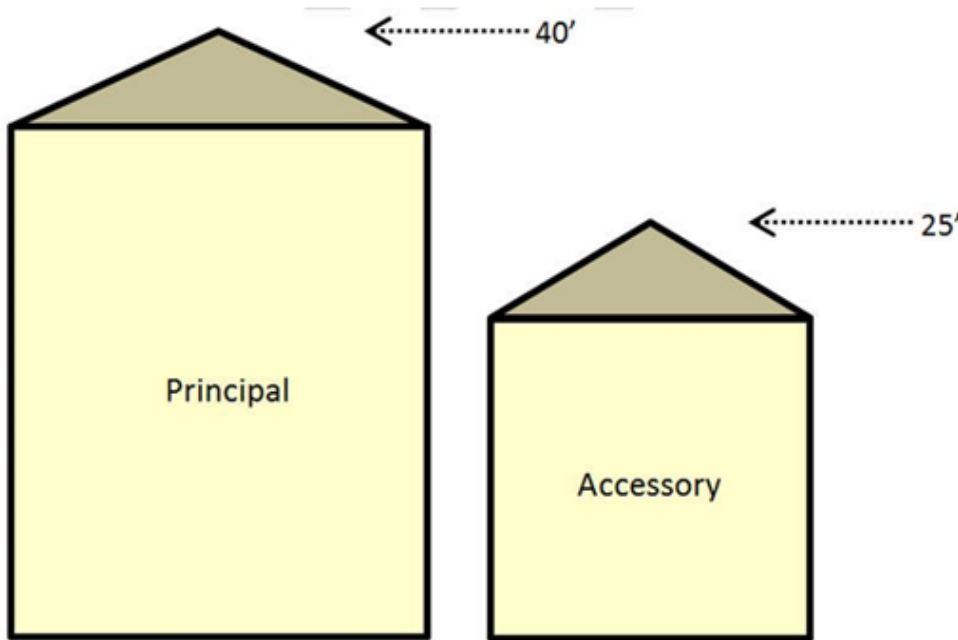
Typical VMU-1 Zoning District Building Height Example (Abutting Lots Not Developed)(Not Drawn to Scale)
